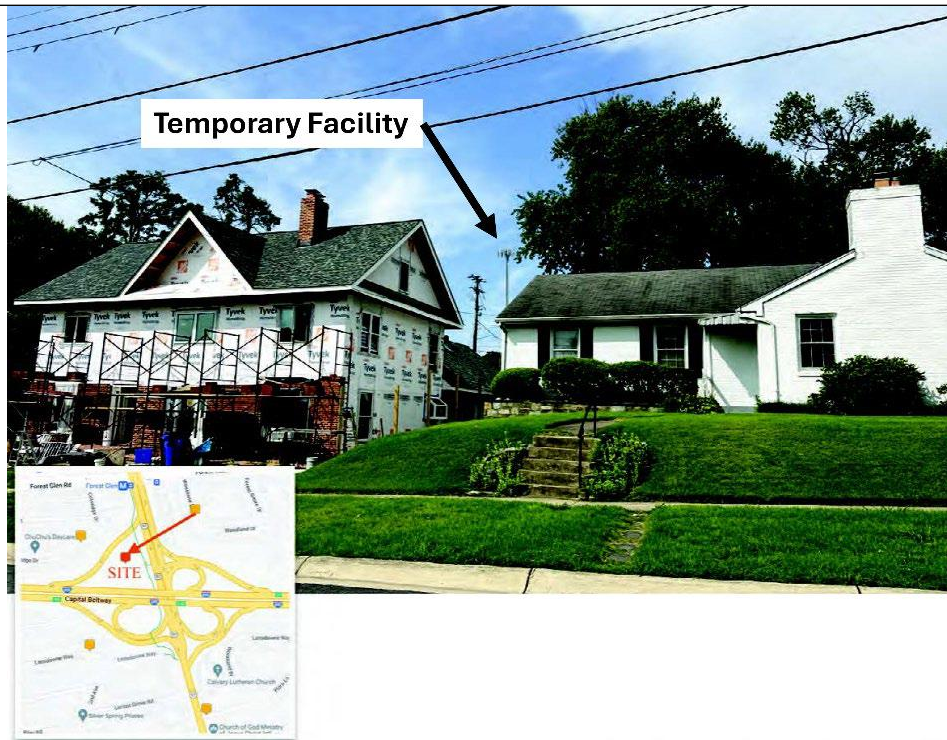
, p. 11, Figure 8: View of Facility from northeast
